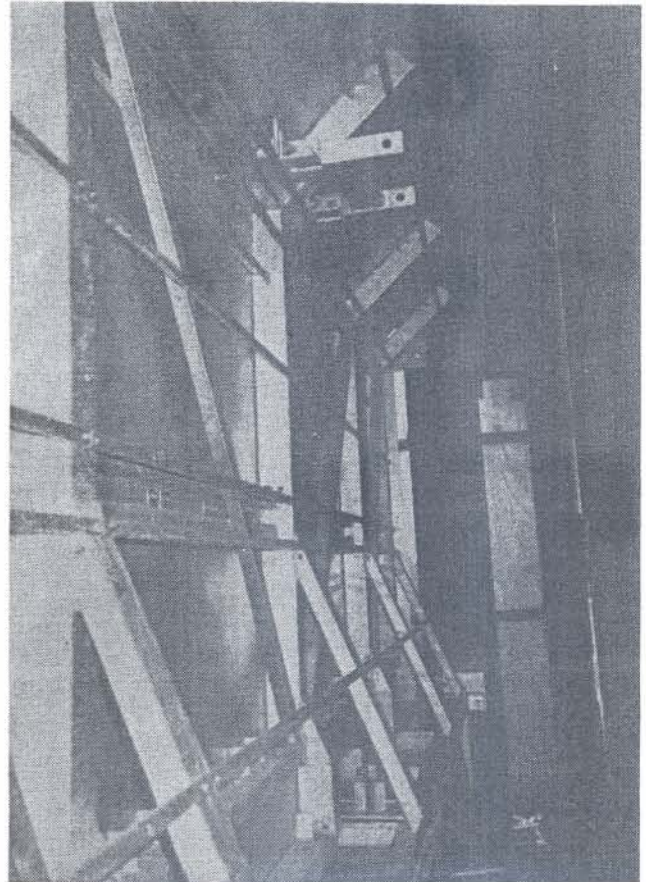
Canary Wharf FC5 London. Plaza level arch cladding panel. Back view of the steel frame.
